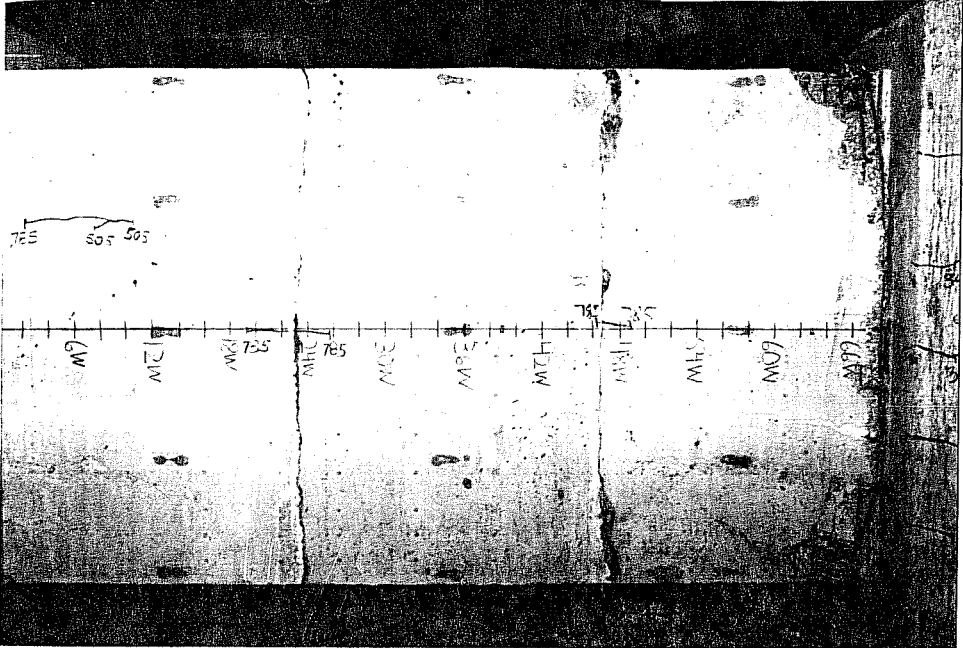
Specimen 3PM Cracks Marked before Failure (compression face on top)
